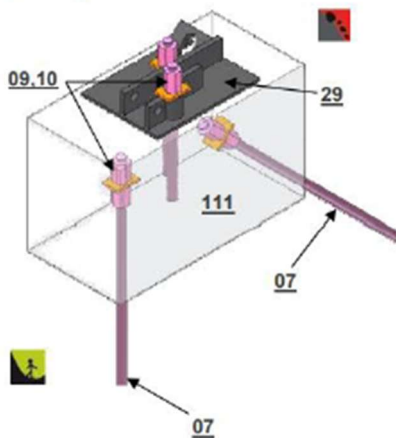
Base system in concrete (Geobrugg, s.d.) reported by (Marchelli M. , 2020)
